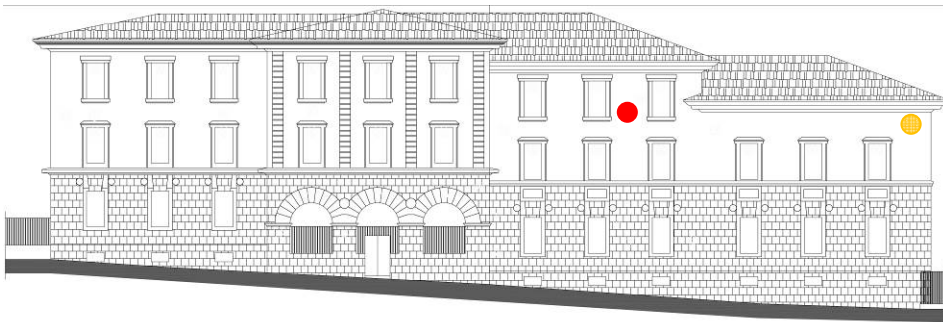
West view of the inspected building. Dots locate the measurement points.
